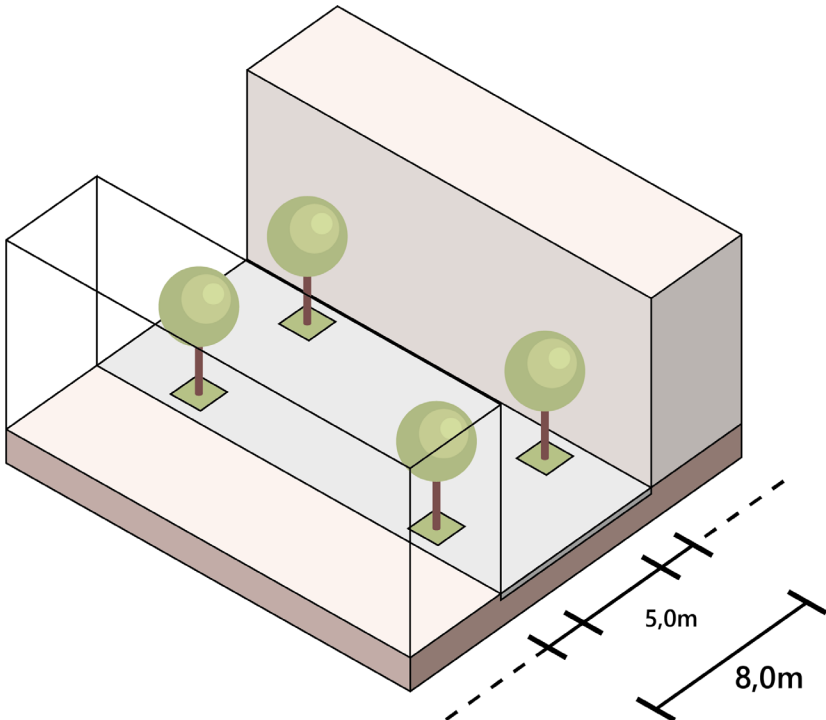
Axonometric street segment and potential interventions of type 9b. Made by Author.
